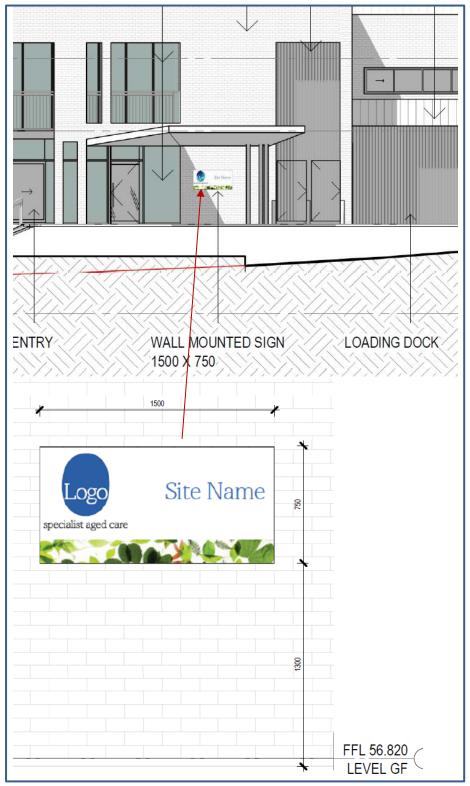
Sign 2 – Building Sign affixed to northern façade under the port cochere.
